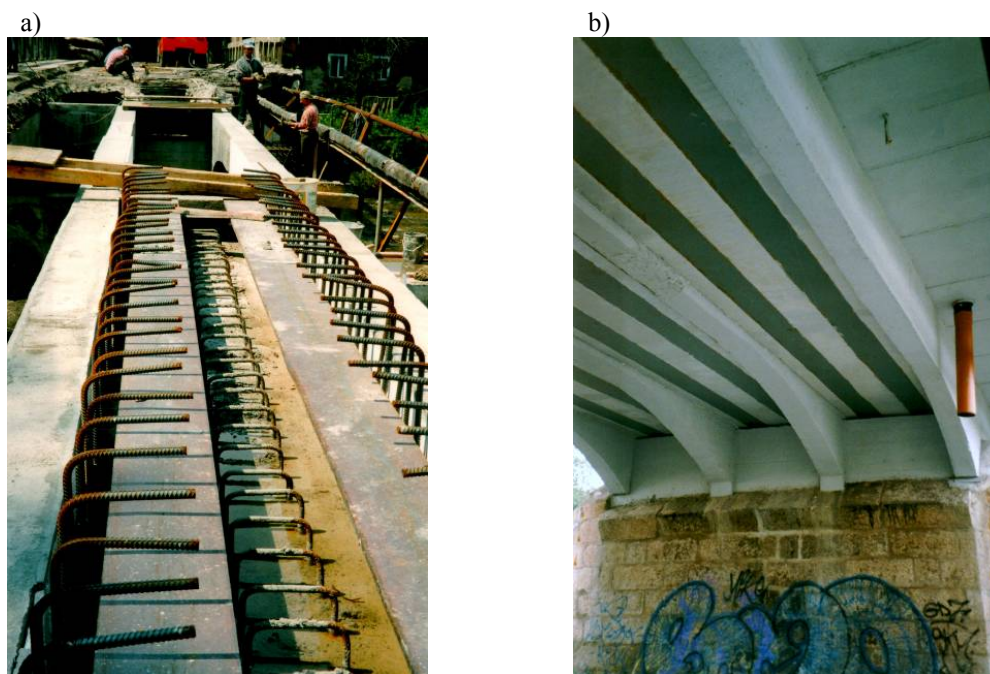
a) Midspan cross-section of the bridge after restoration (part of structure), b) Typical precast concrete – encased girder making composite rib in new deck and girders arrangement.
